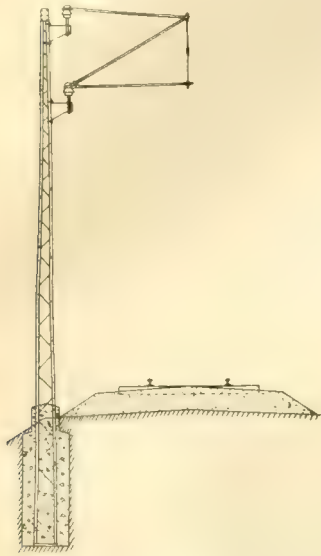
STANDARD TROLLEY POLE AND BRACKET CONSTRUCTION
